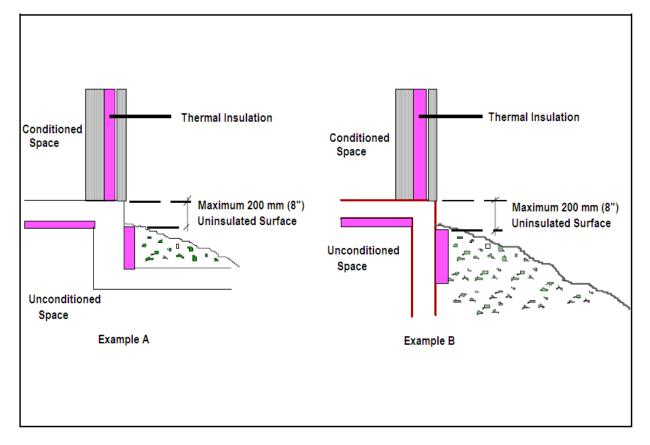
Maximum Uninsulated Surface of Foundation Wall
